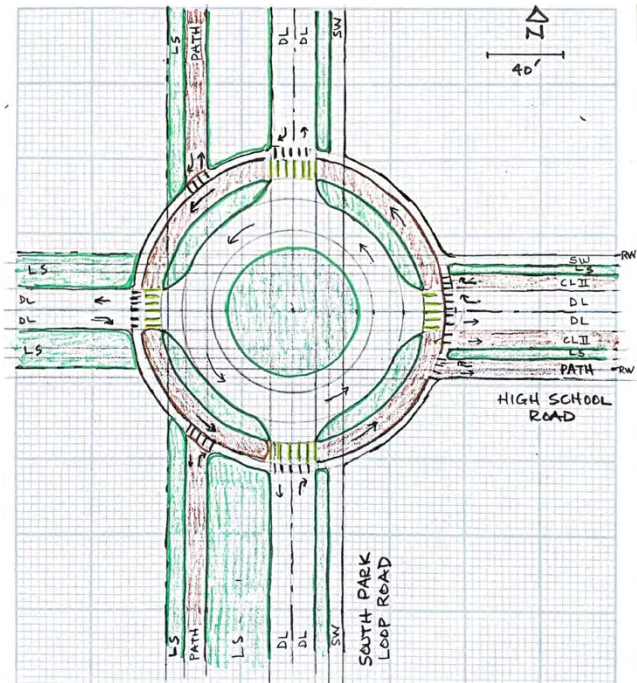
Conceptual roundabout plan for the intersection of High School Rd. and South Park Loop Rd.
